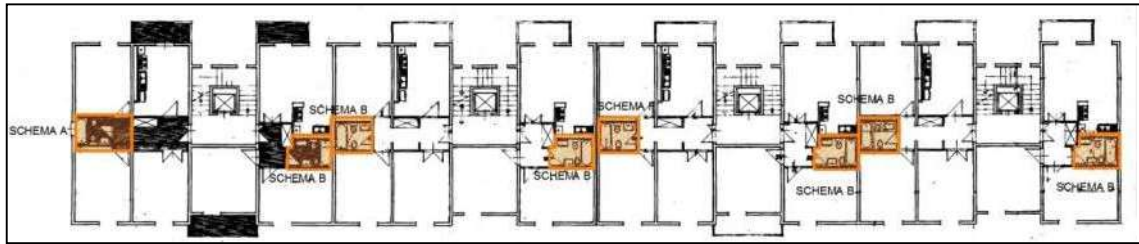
Toilets Layout Building A. In orange the bathroom types.
